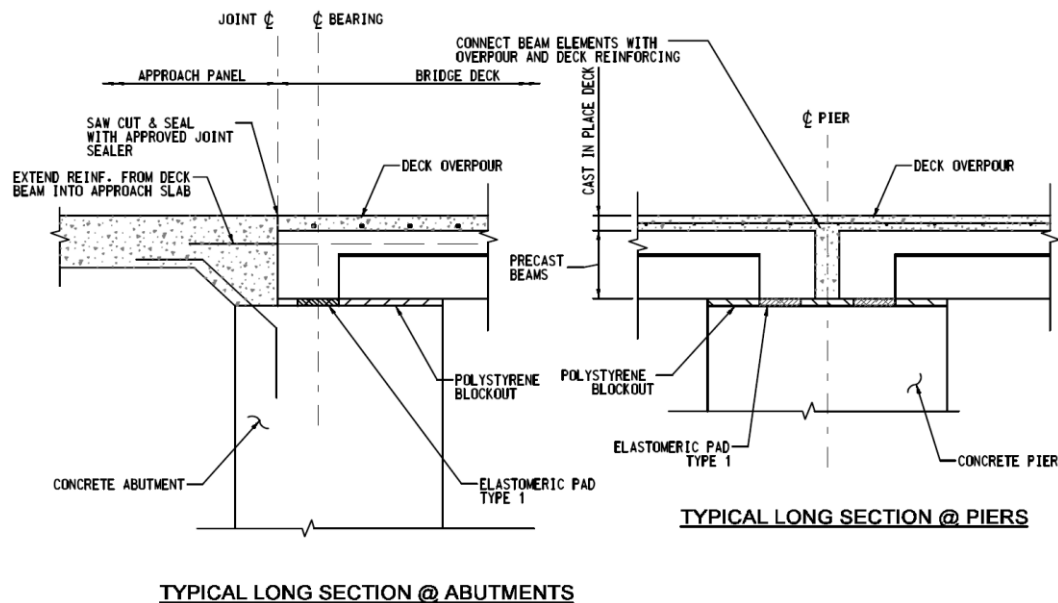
Transverse Connection between Beams over Pier and Abutment [U5]
